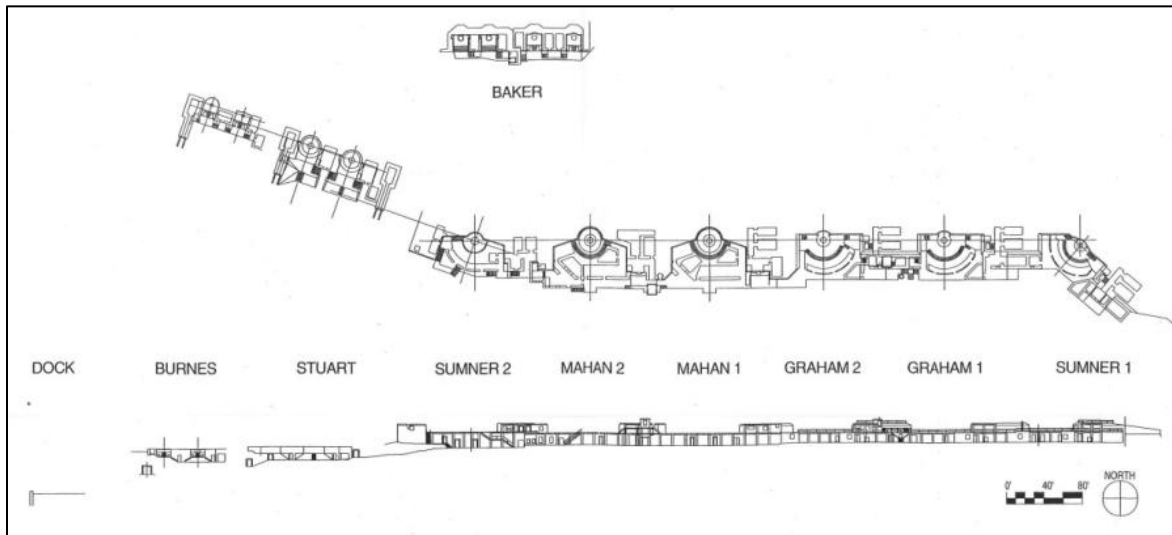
Plan and Elevations of the Endicott Batteries (Beyer Blinder Belle, 2000, 7-20)
